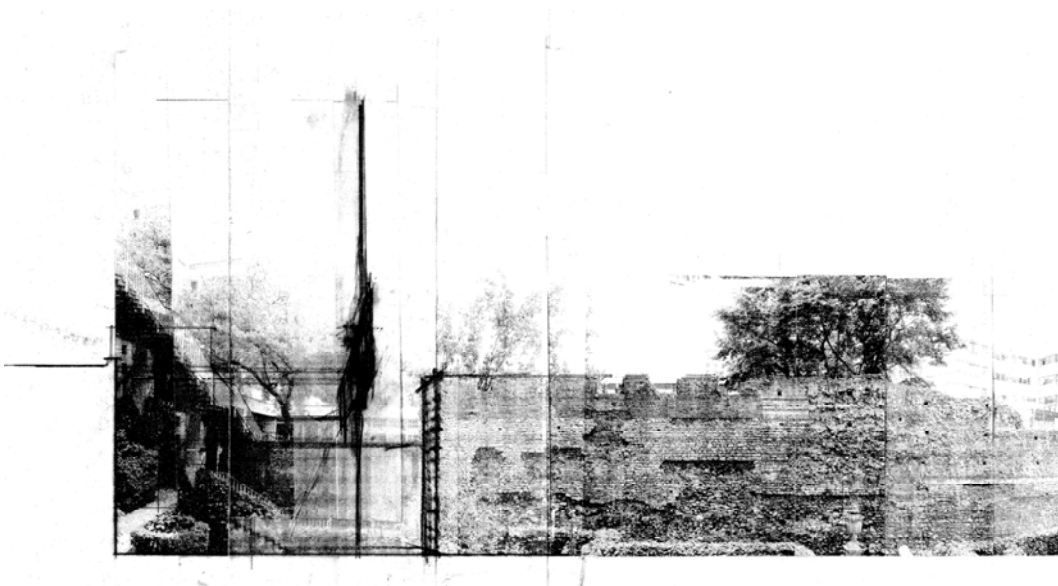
Proposed gantry and mechanical spire, section looking south towards fragment of city wall from the Salter's Garden.
